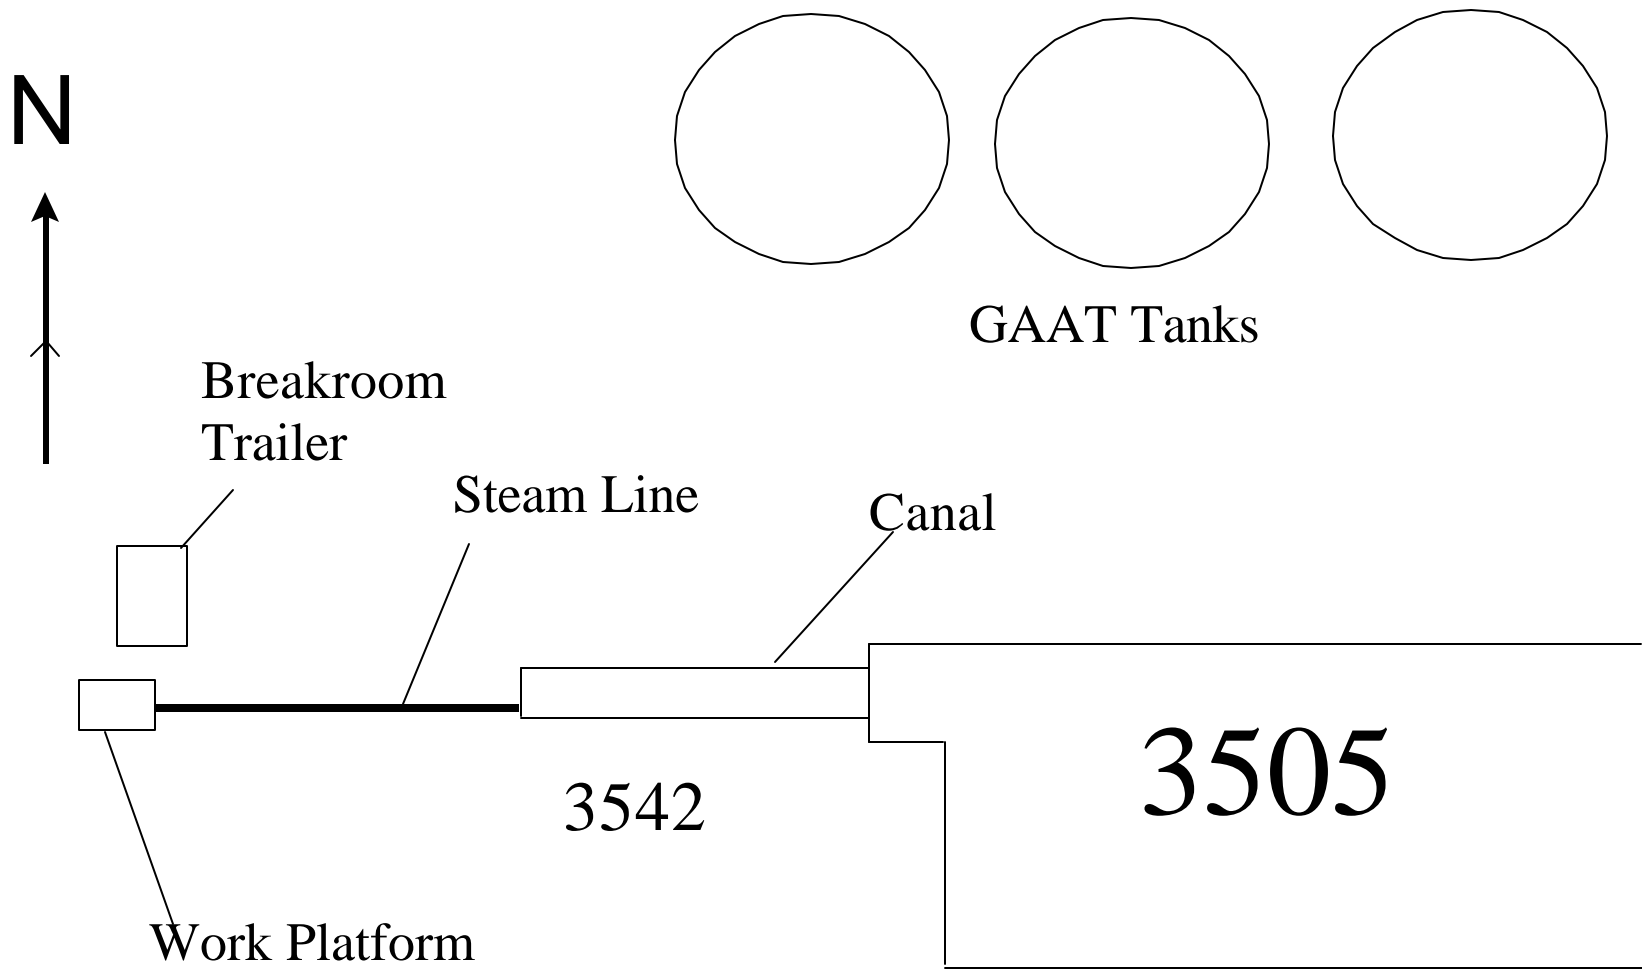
Site Layout with Steam Pipe and Platform Locations
